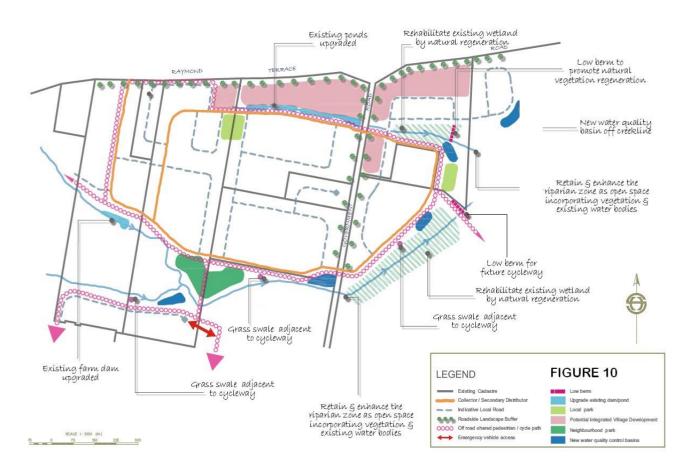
Thornton North - Government Road Precinct - Landscaping Plan.
